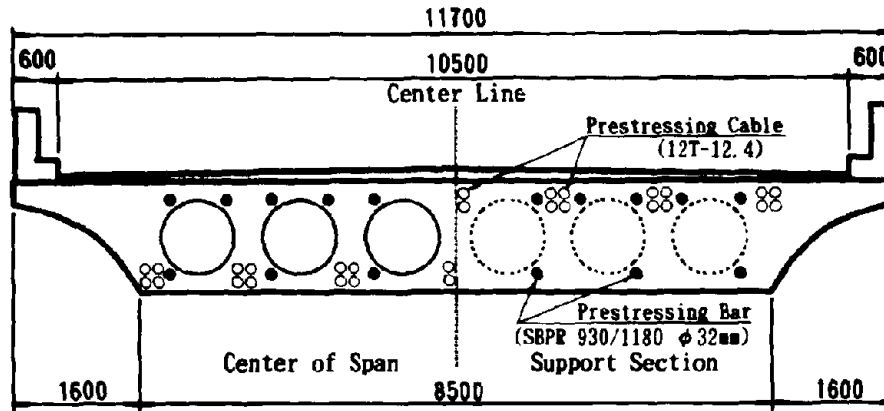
Distribution of Prestressing Steel in a Standard Cross Section
